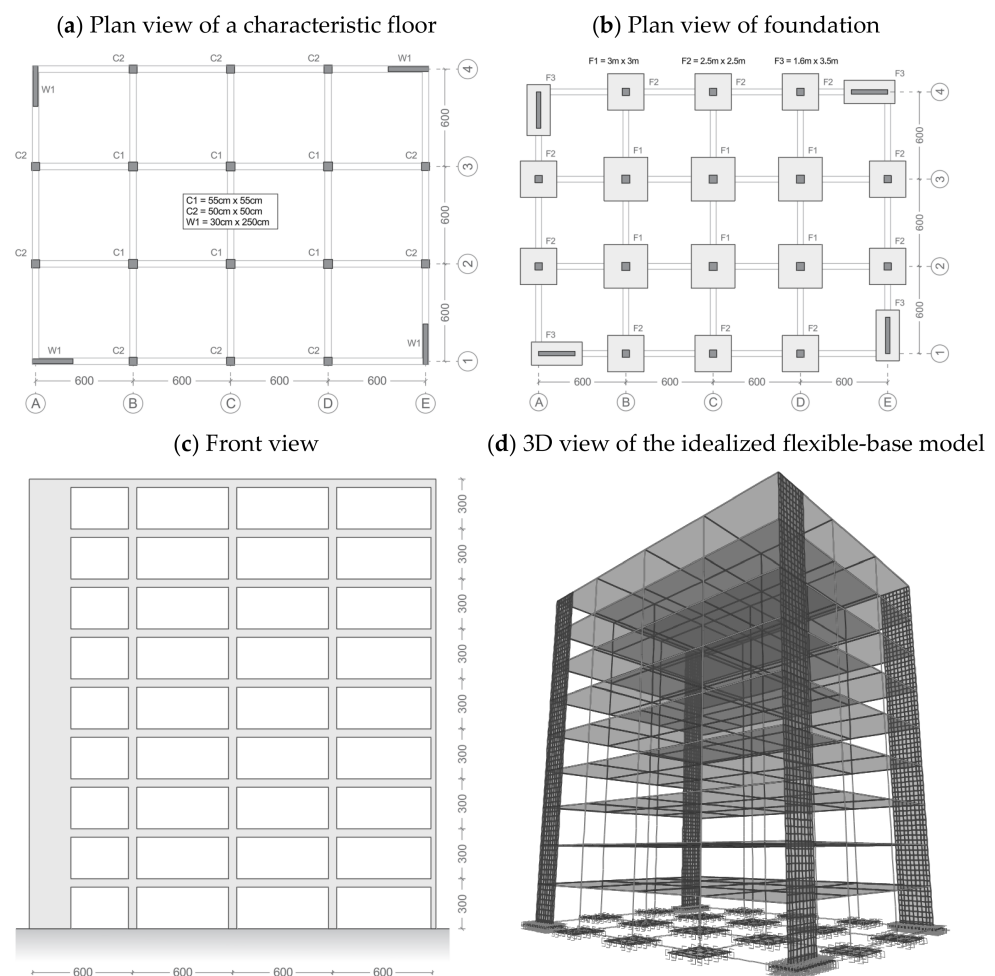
Geometric properties of the hypothetical building. (a) Plan view of a characteristic floor with column and wall size details; (b) Plan view of foundation system; (c) Front profile view; (d) 3D view of the idealized flexible-base model.
